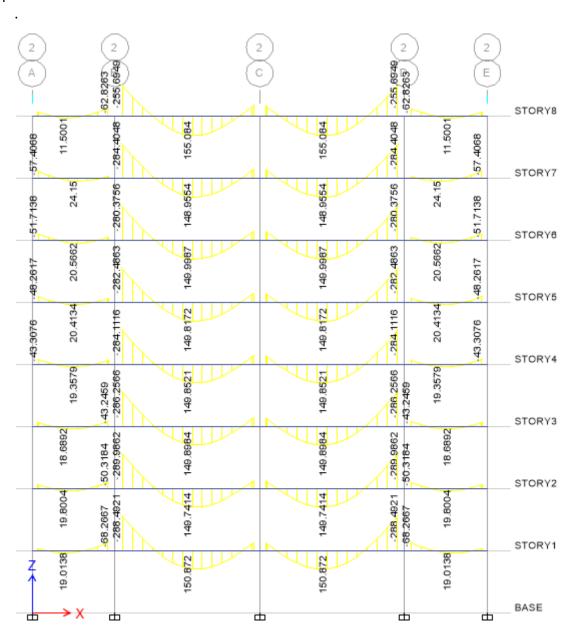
18. Effort diagram of the fundamental grouping for the central longitudinal frame foundation beam and joint
